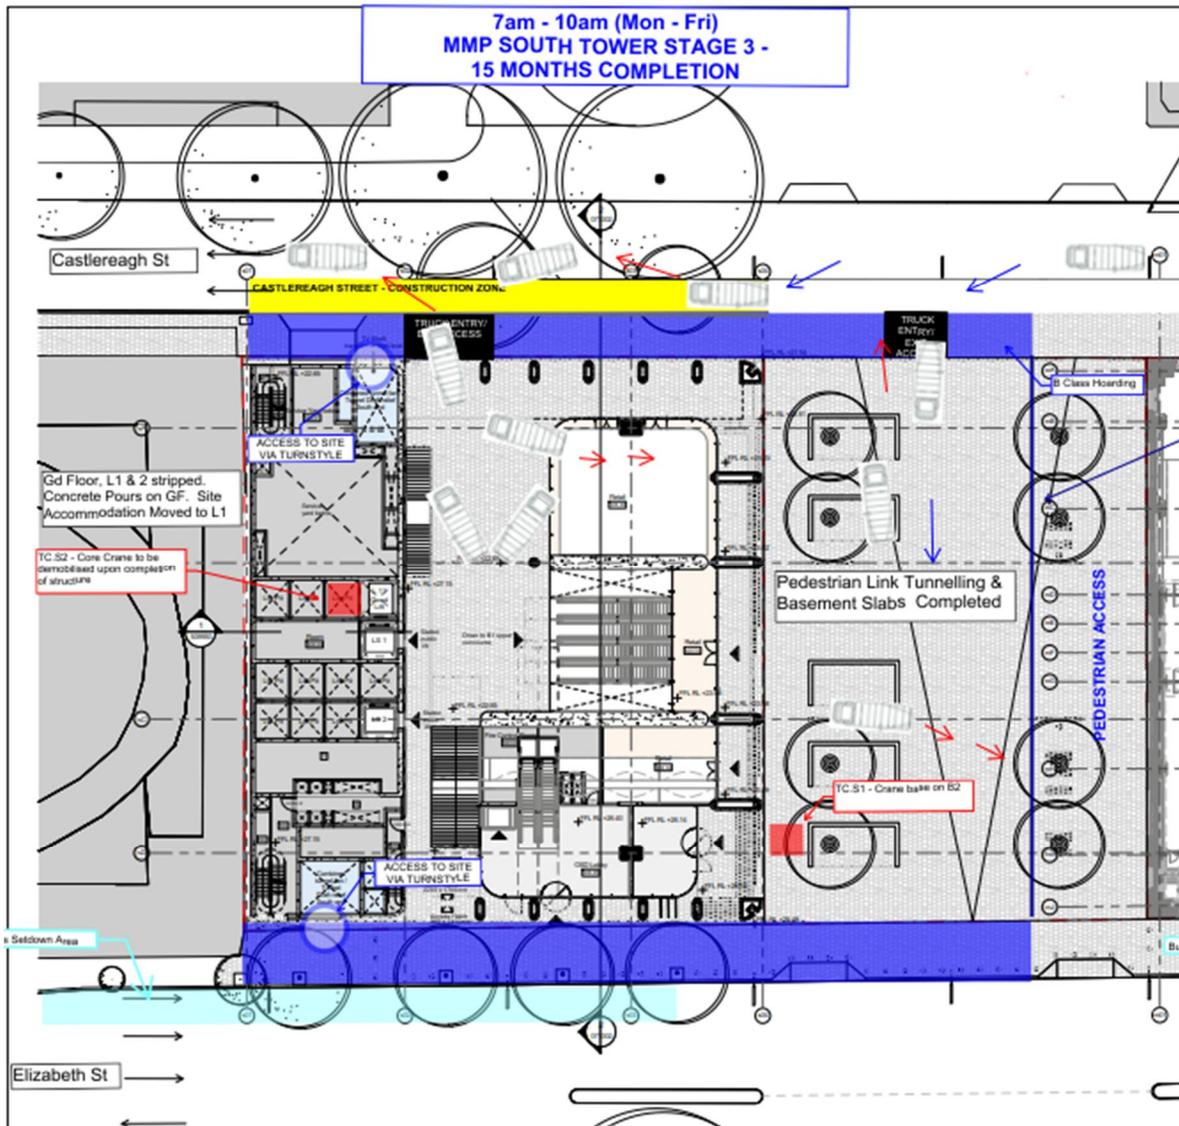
Construction Zone Stage 3 - 7am - 10am
